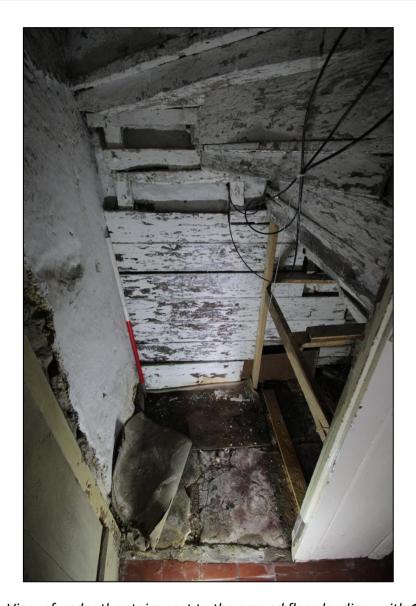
View of under the stairs next to the ground floor landing, with 1m scale.
